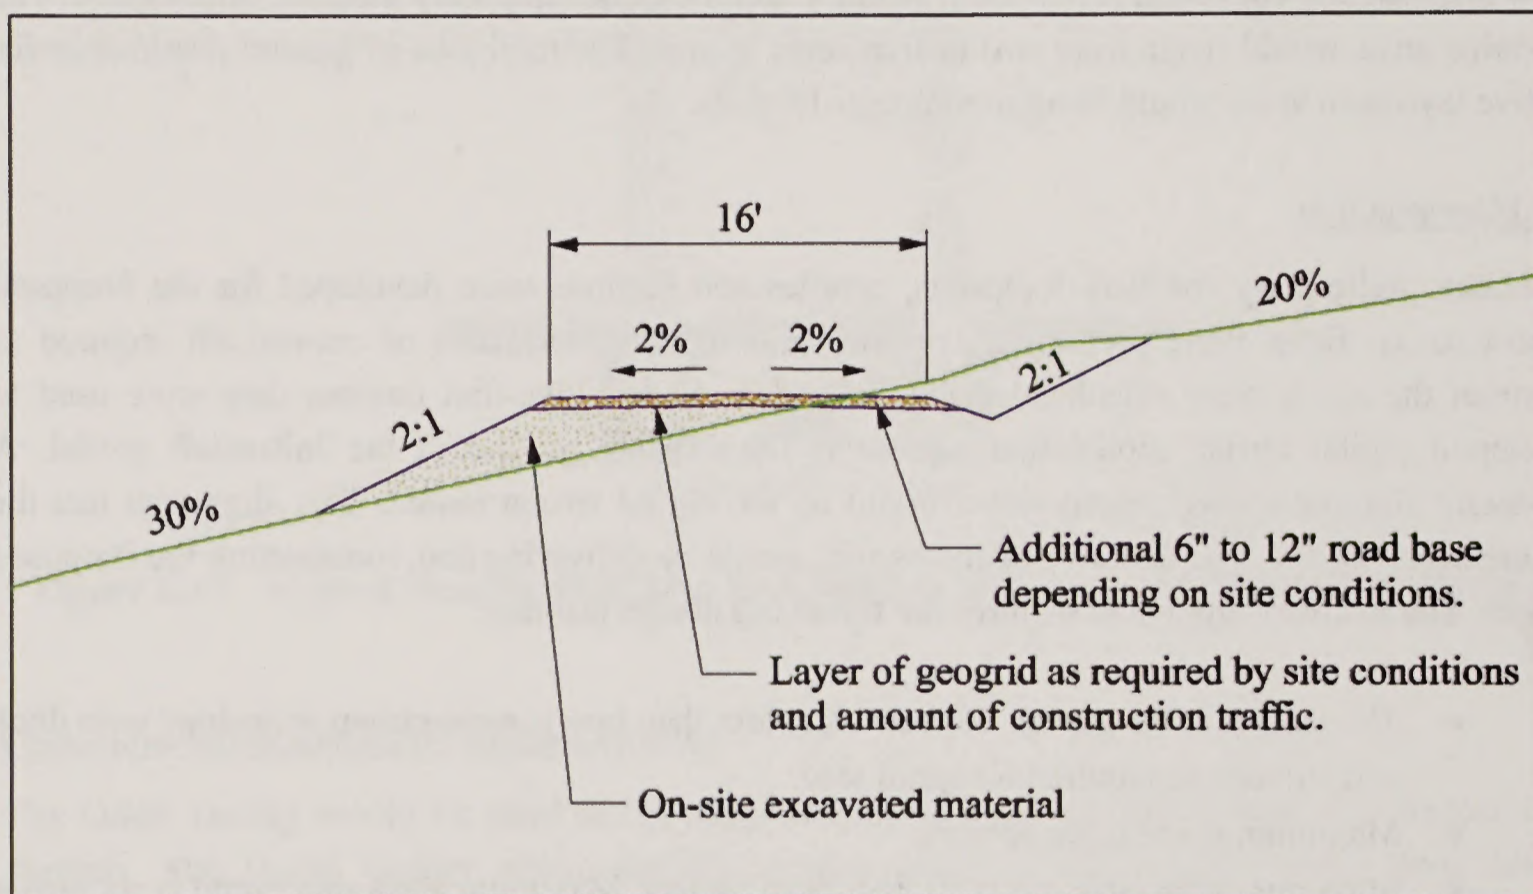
Typical Cross Section for Project Access Roads.
